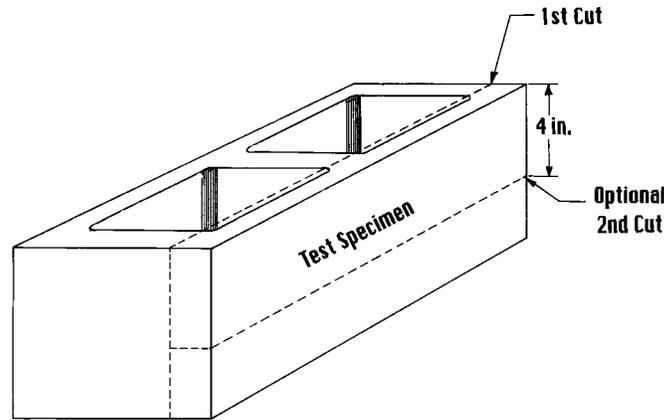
View of Sawed Block Showing a Suggested Sequence of Cuts and Location of Half-Face Shell Specimens
